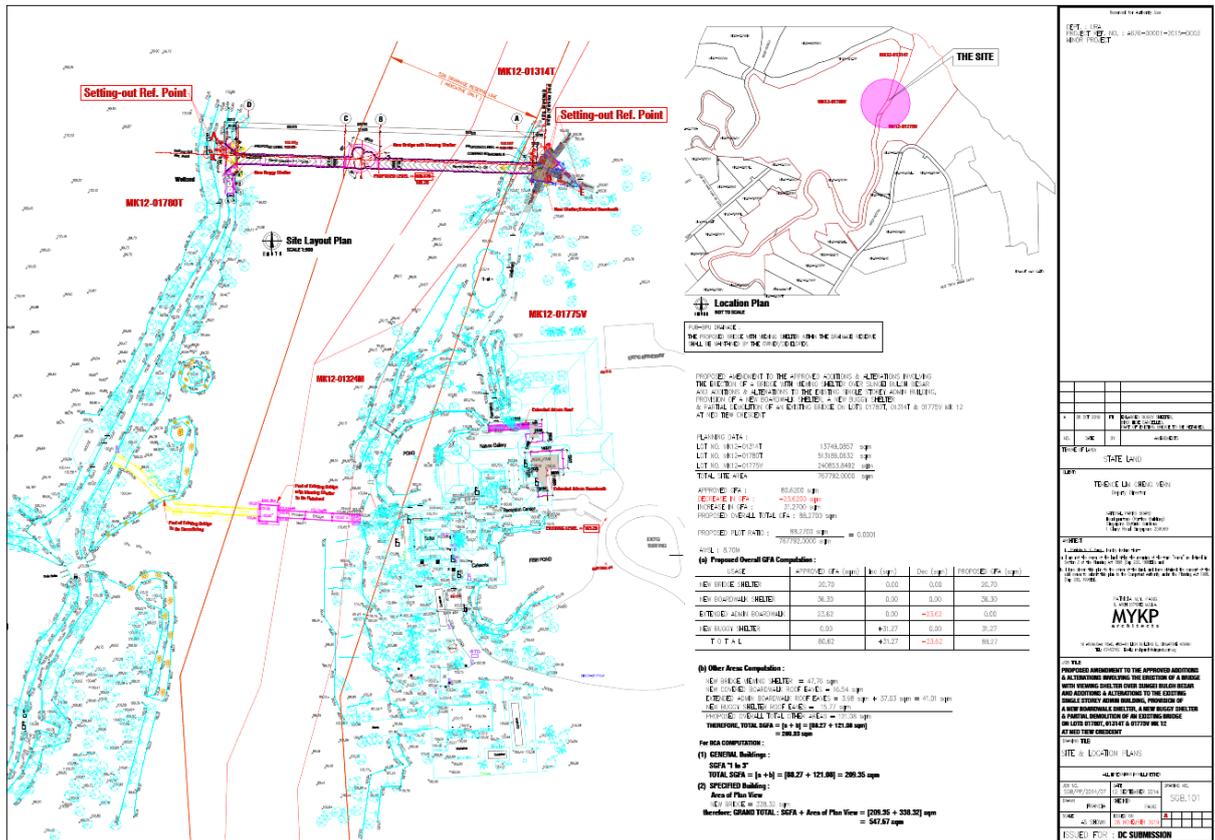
Site plan for the existing main bridge and the proposed new bridge
